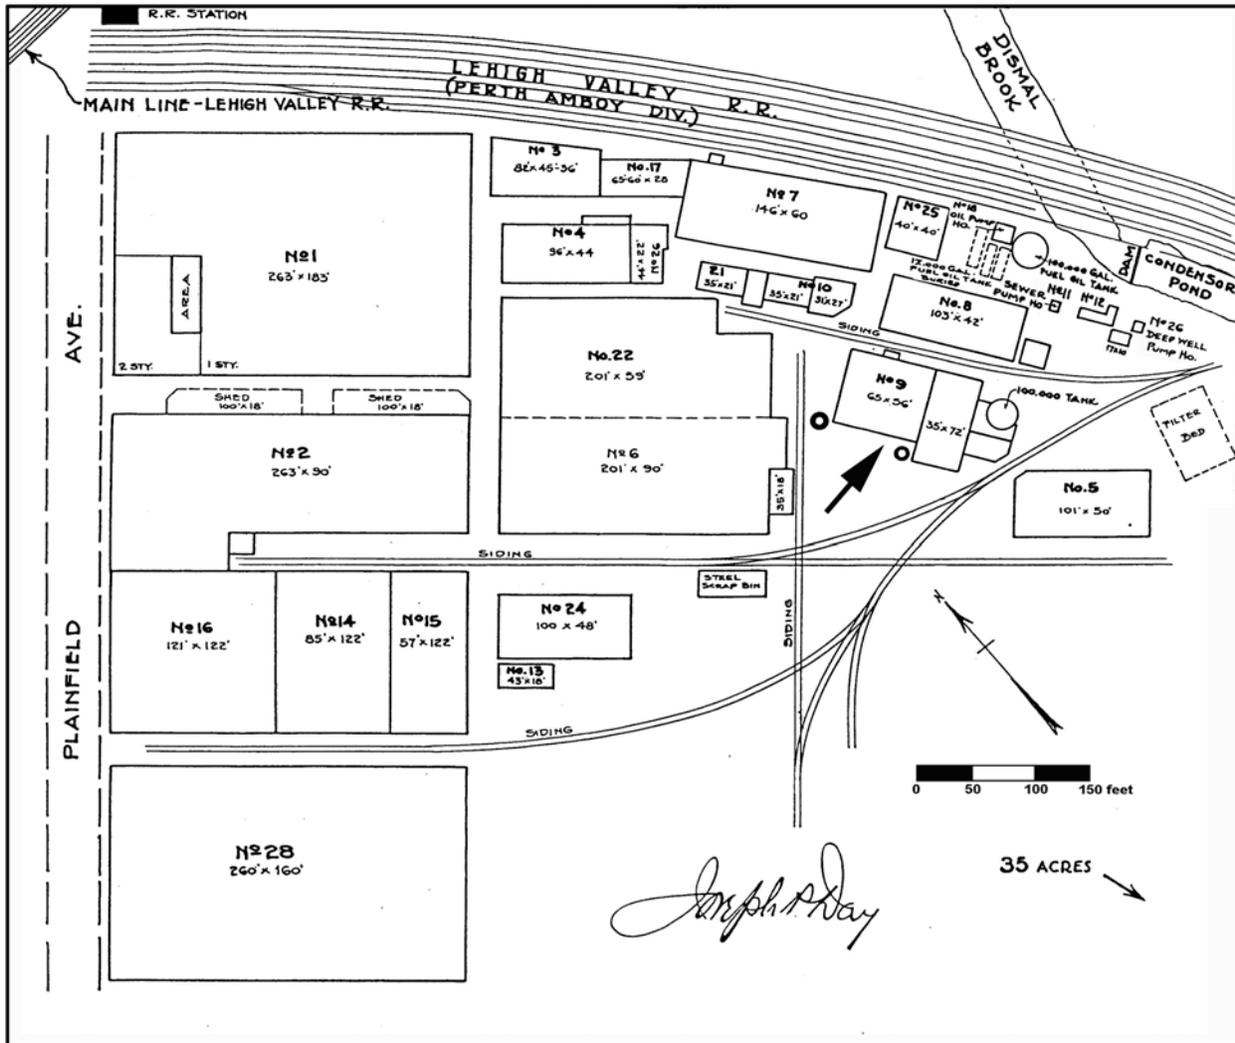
BUILDINGS 9 AND 30 AND 1929 SOUTH PLAINFIELD WORKS
